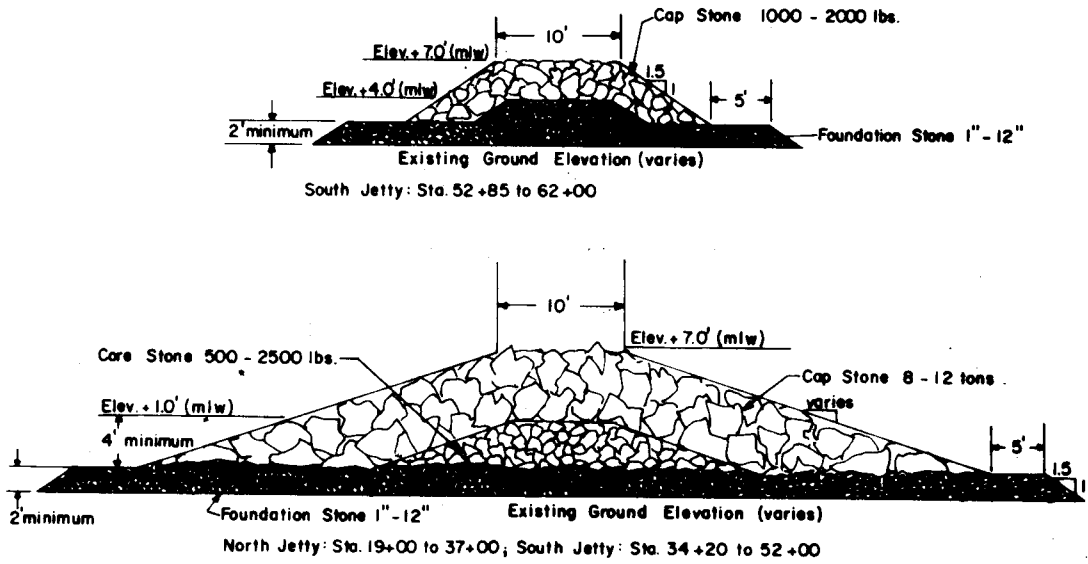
Jetty Cross-Section Details (Corps of Engineers, 1967).
